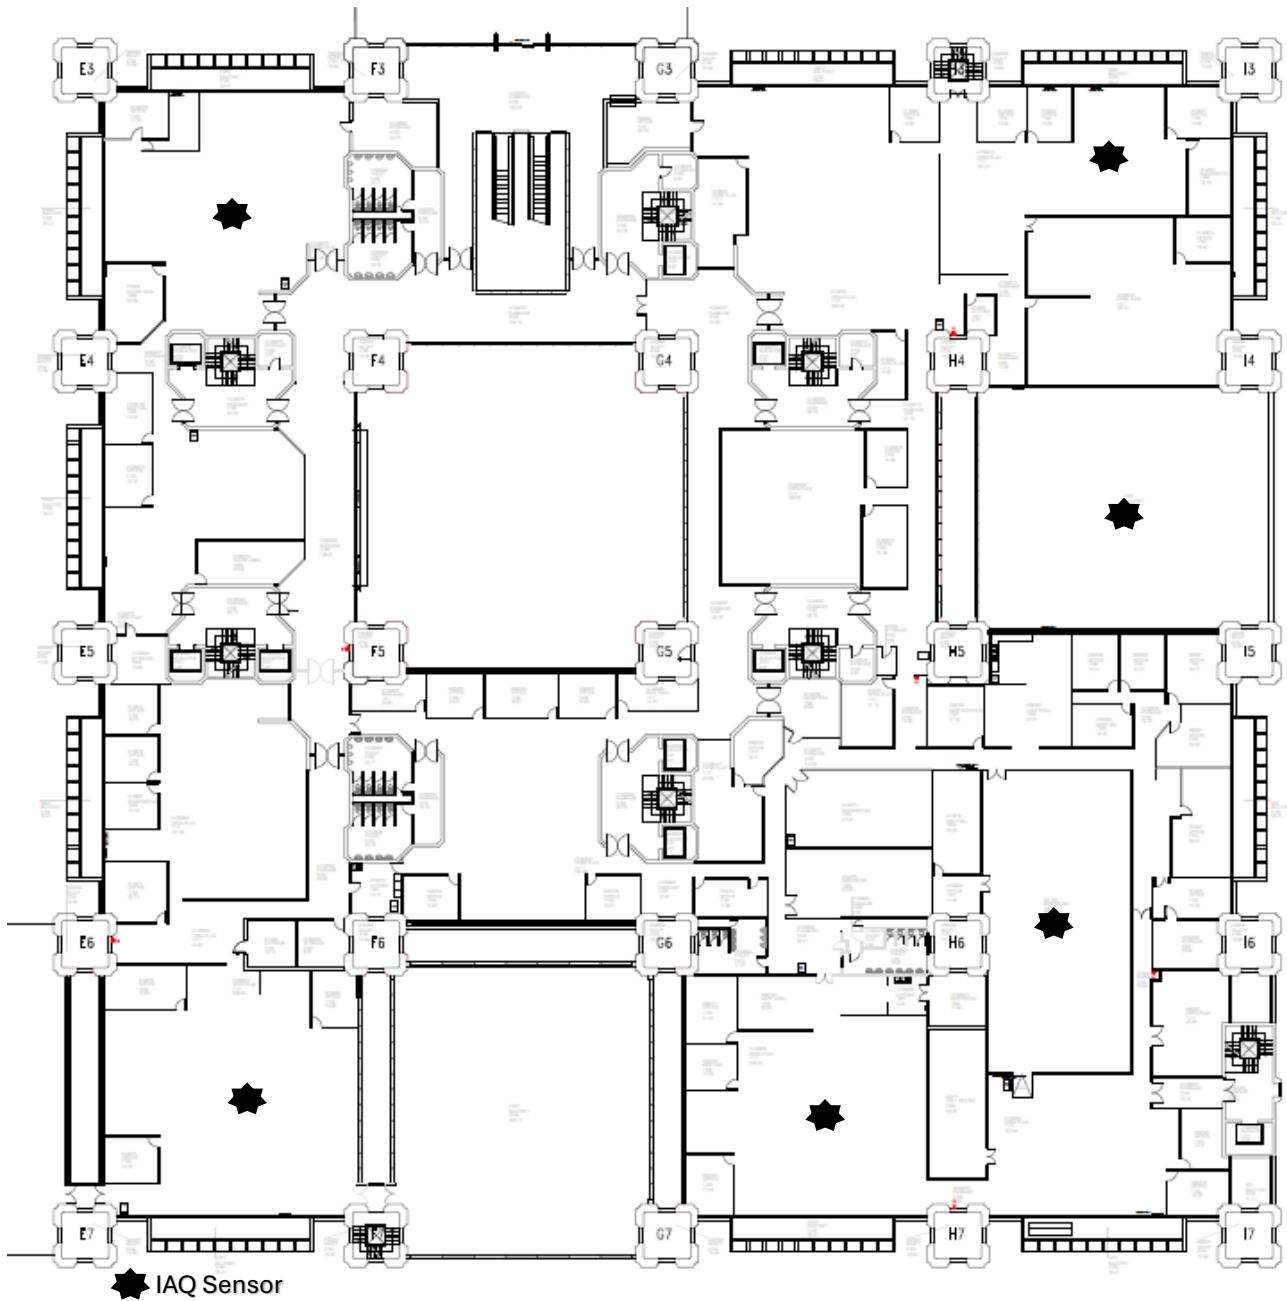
Podium Building proposed sensor positioning 4th floor (6)
